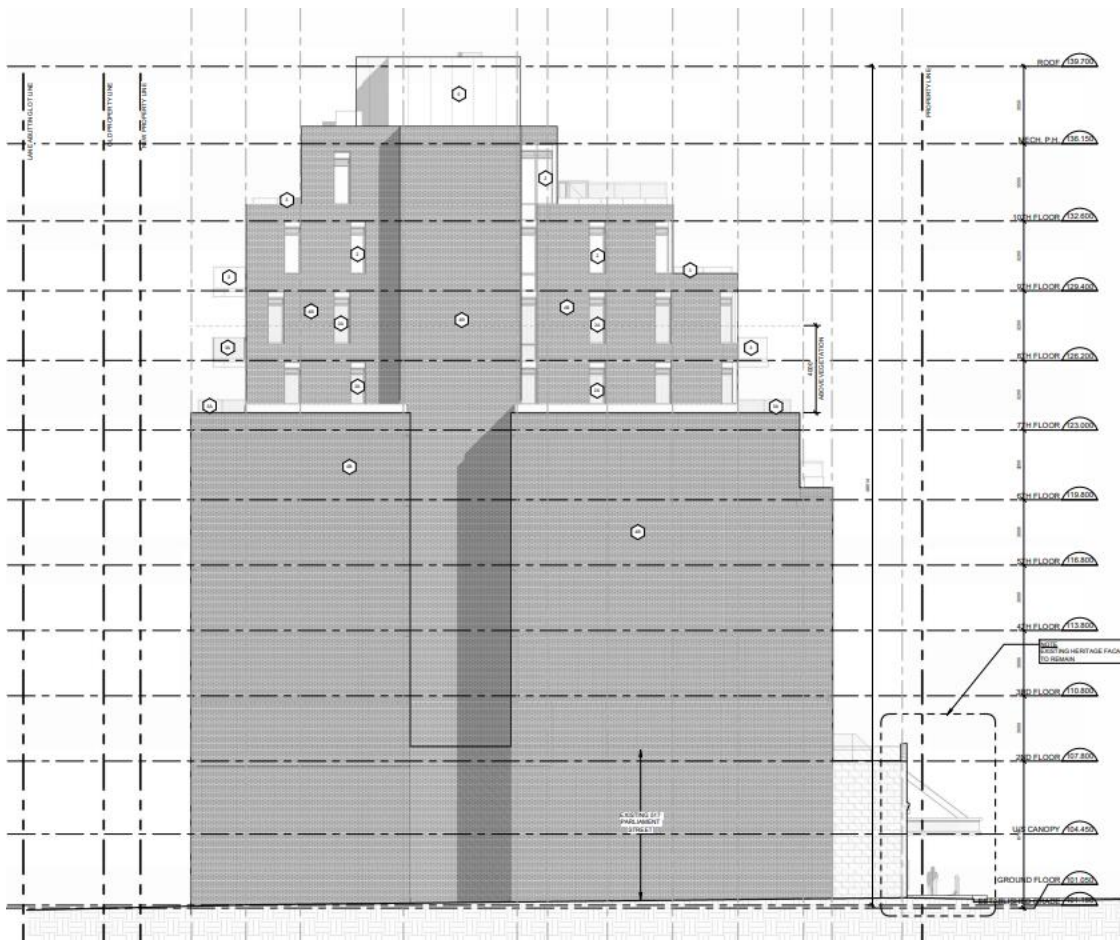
Proposed north elevation of 509 Parliament Street (RAW Architects Inc., 2025).
